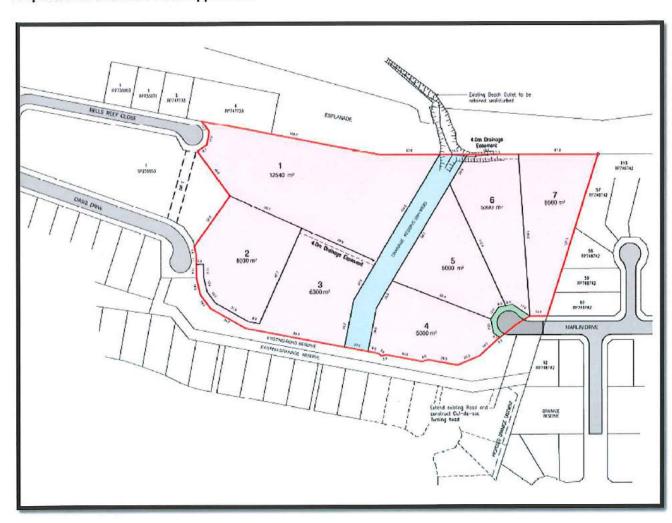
PROPOSAL PLAN (4839-SK01)
